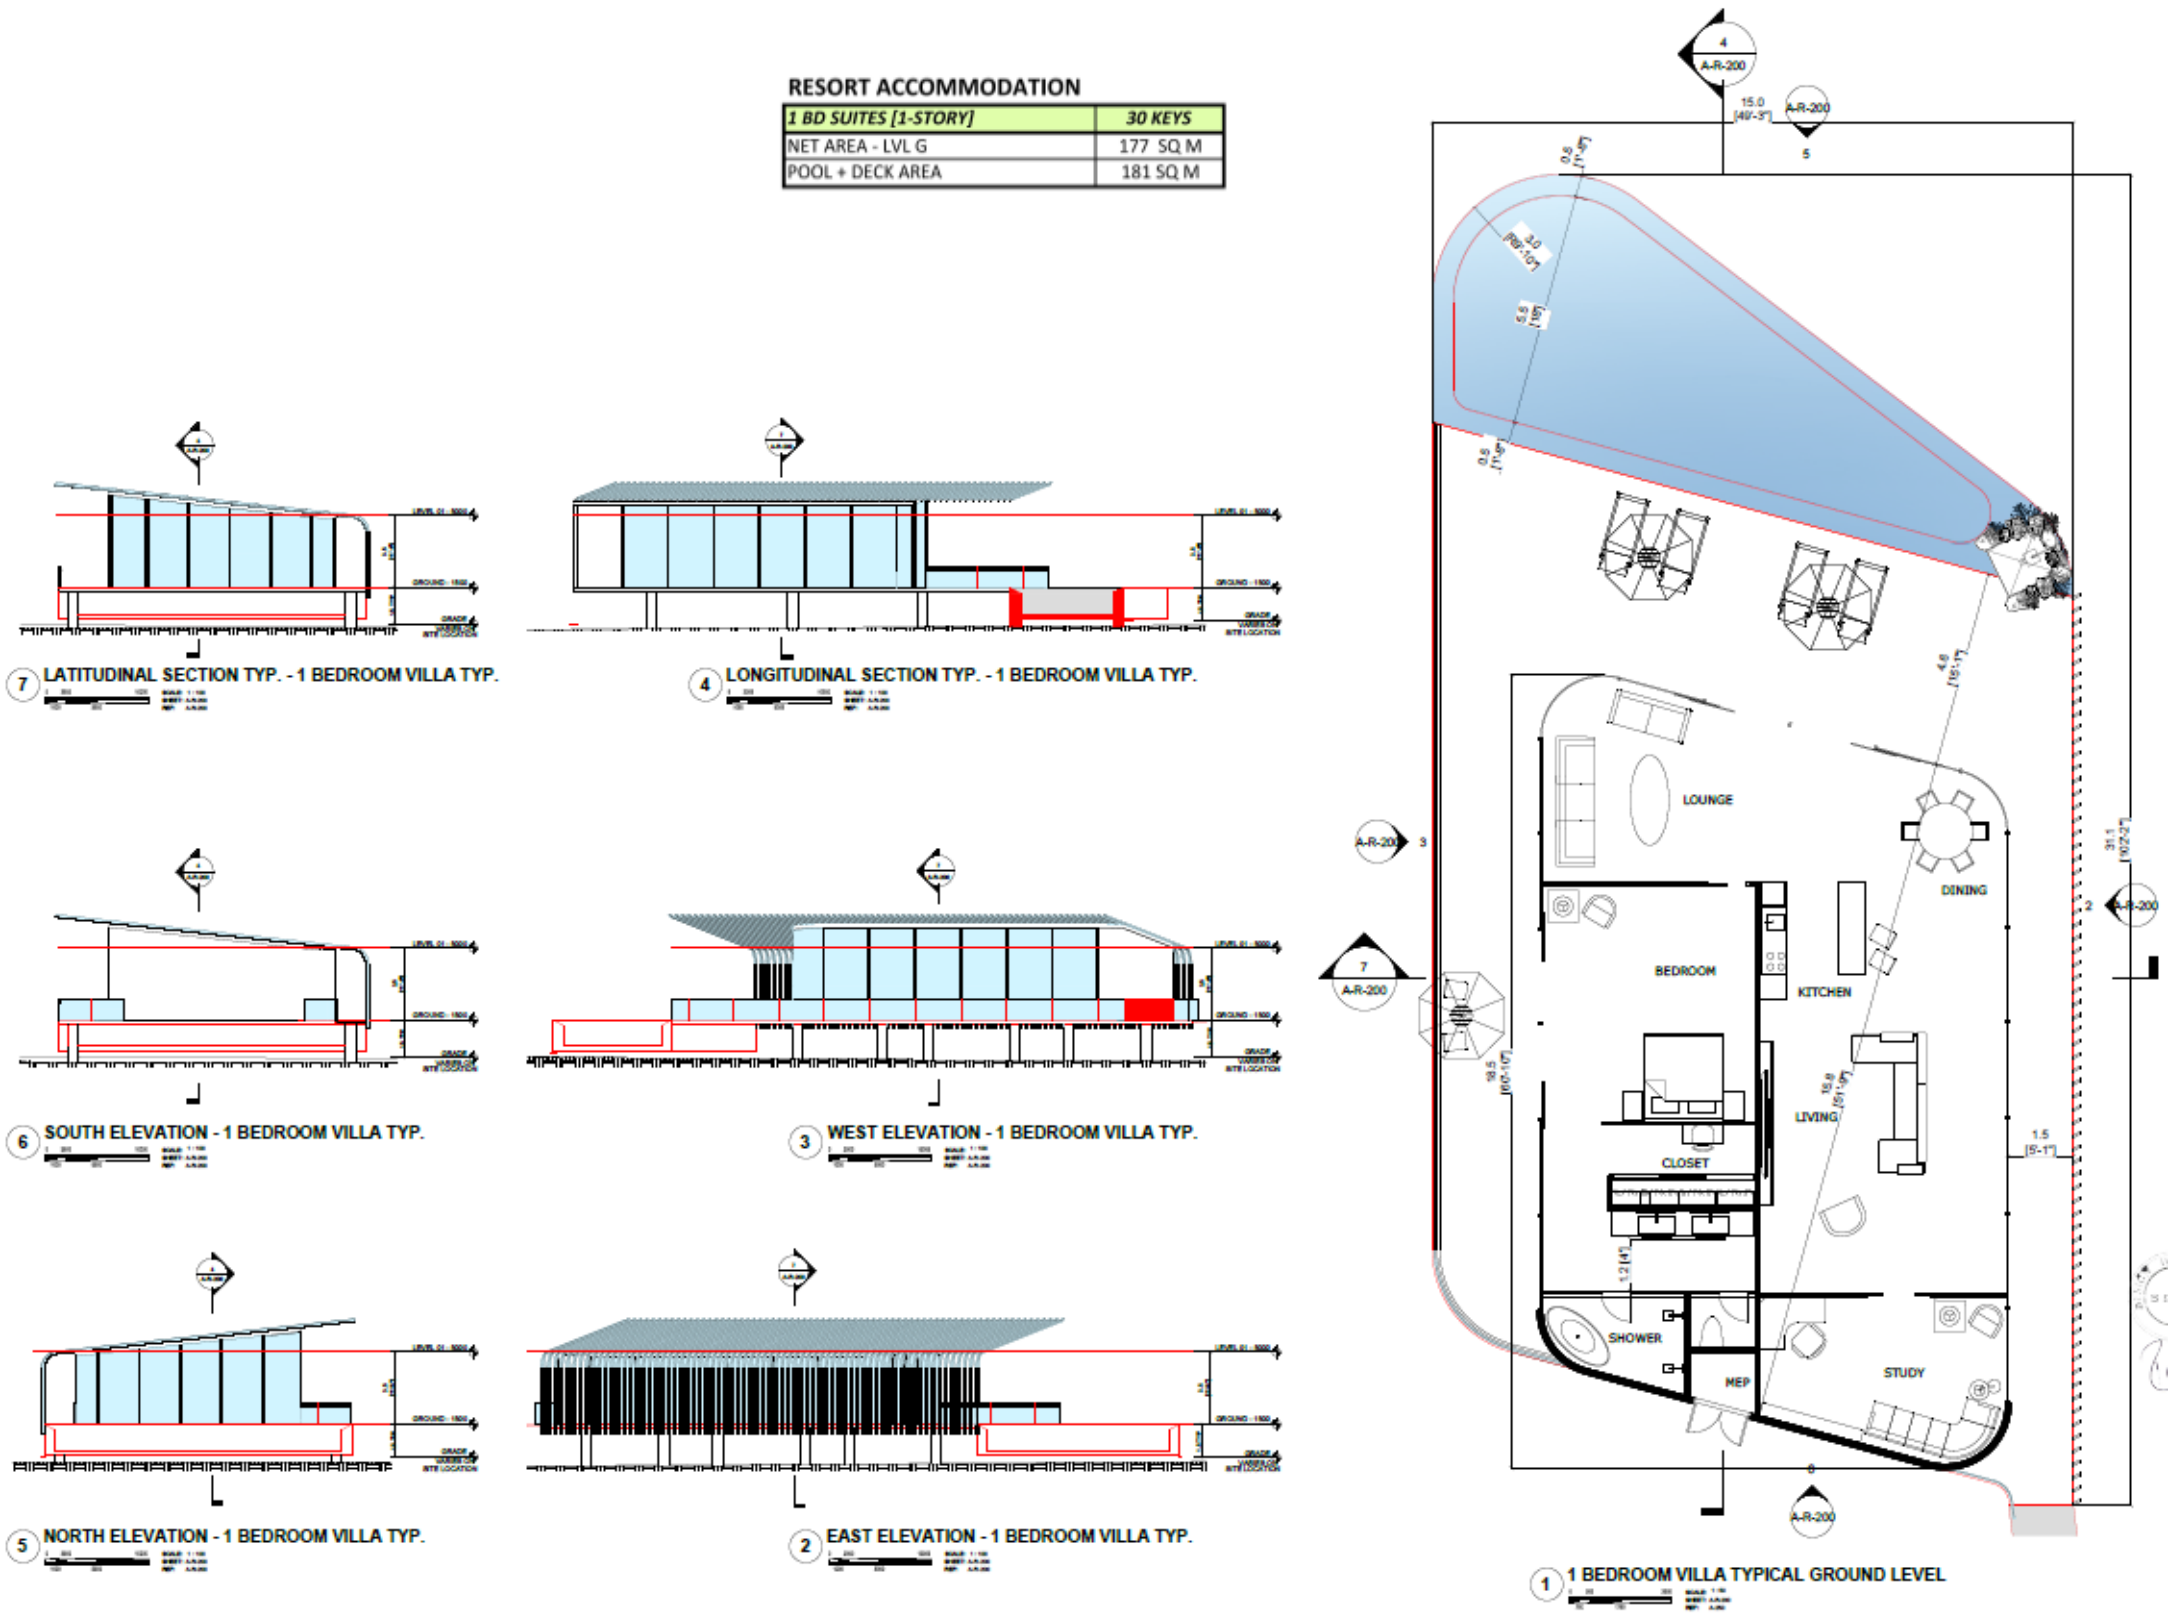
Resort 1-bedroom suite plans, elevation, and sections
